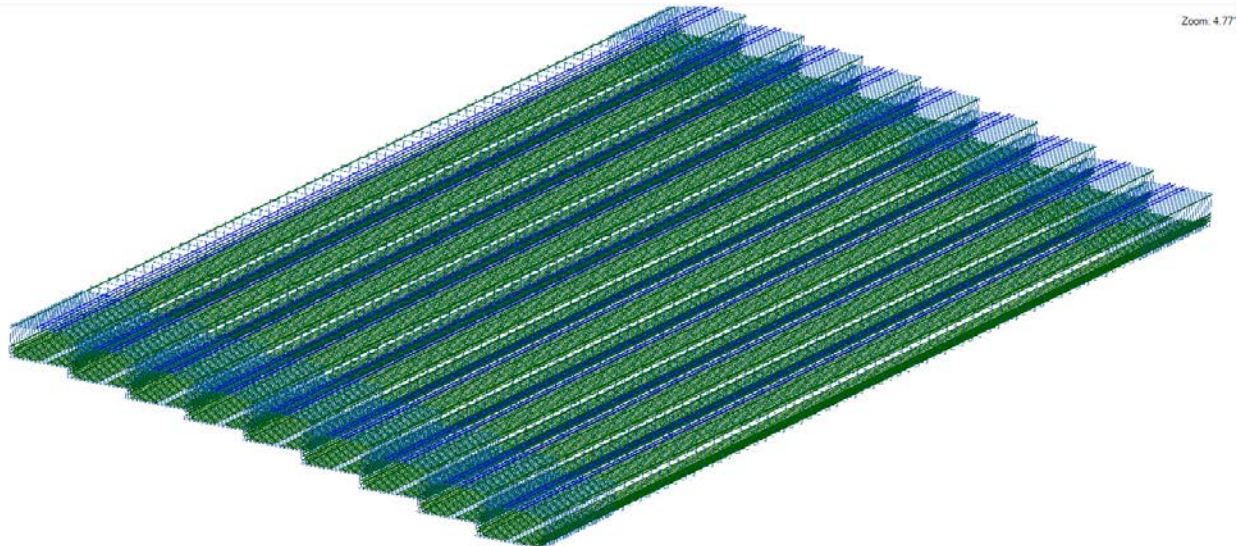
3D View of Reinforcement (strands, longitudinal and transverse) in Box Beams
